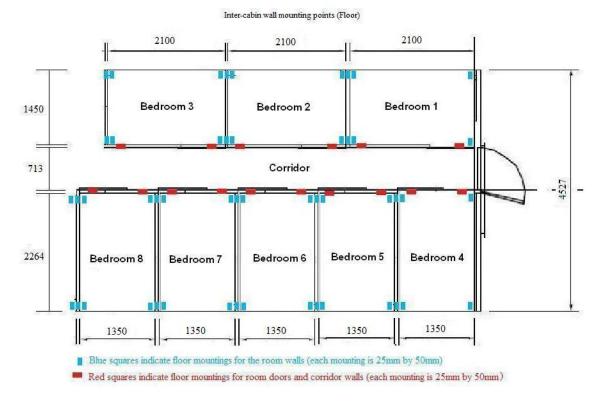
A plan view of the bedrooms and corridor displaying the mounting points for the inter-cabin walls. NOTE: All measurements are in millimetres (mm).
